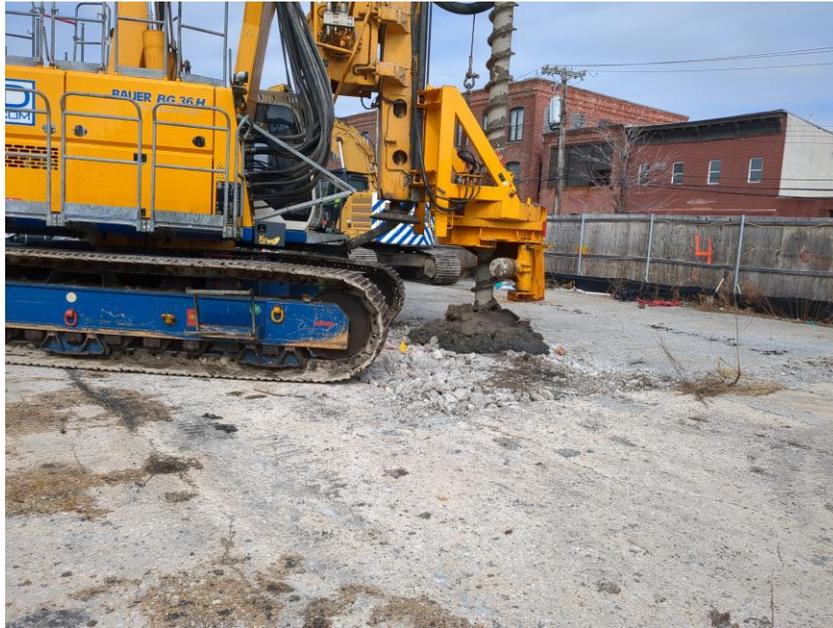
ECD advancing CFA pile R-4C in the central part of the site (facing north).
